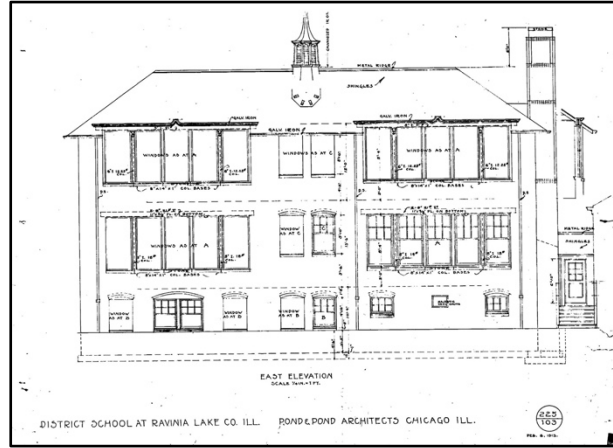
1913 School Building East Façade. From Ryerson and Burnham Art and Architecture Archives.
